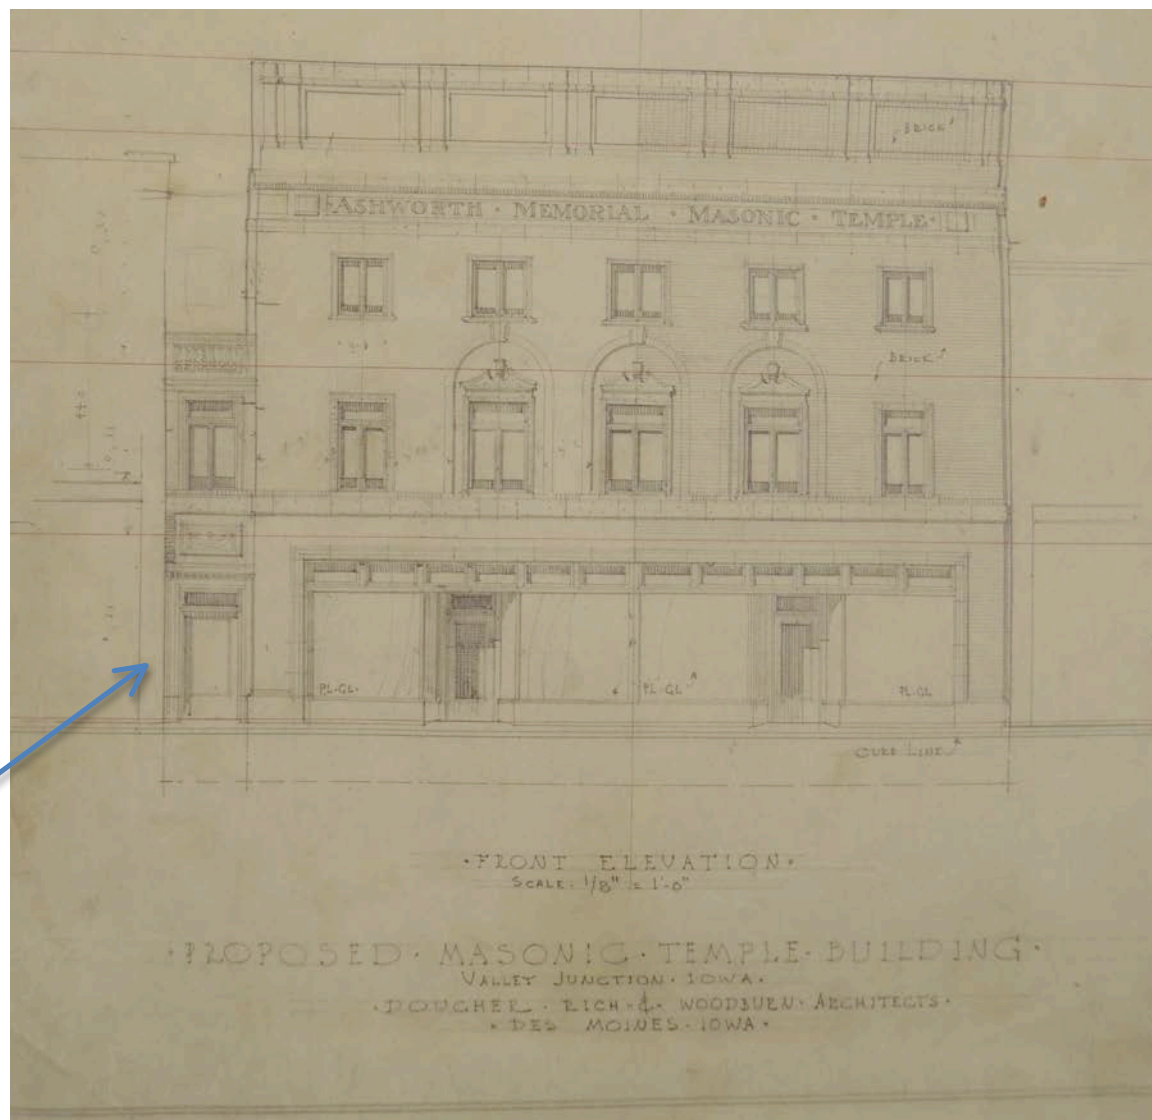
Draft rendering (not built as shown) showing three-story or possibly four-story "Proposed Masonic Temple Building" with two-story north enclosed staircase building for I.O.O.F. at left (arrow). (Dougher, Rich and Woodburn)
